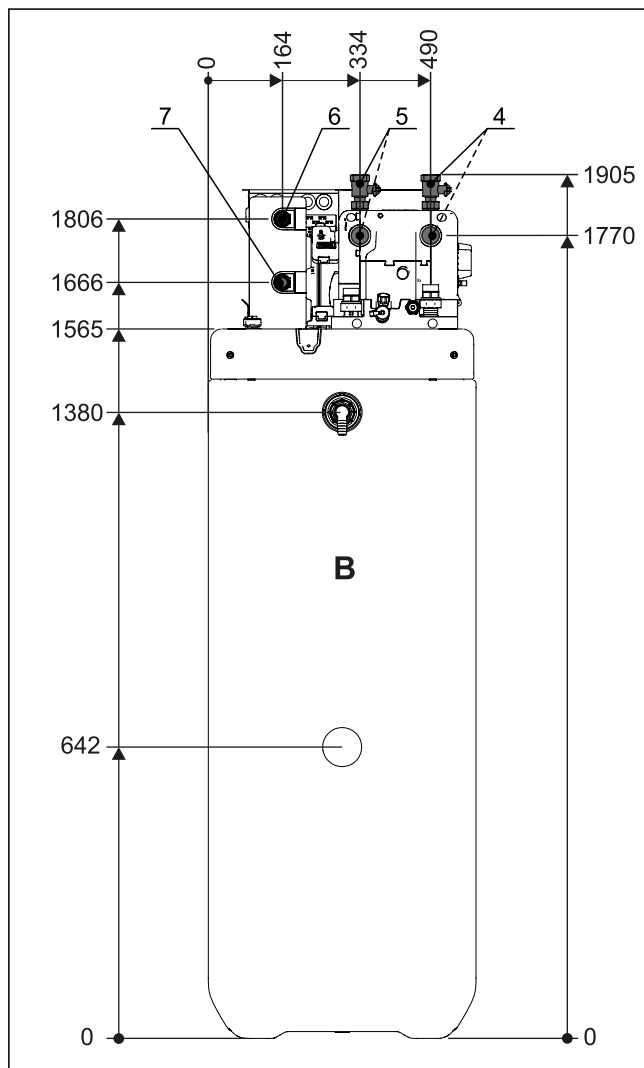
Dimensions, side view – ETS(X/H)B16P30D
